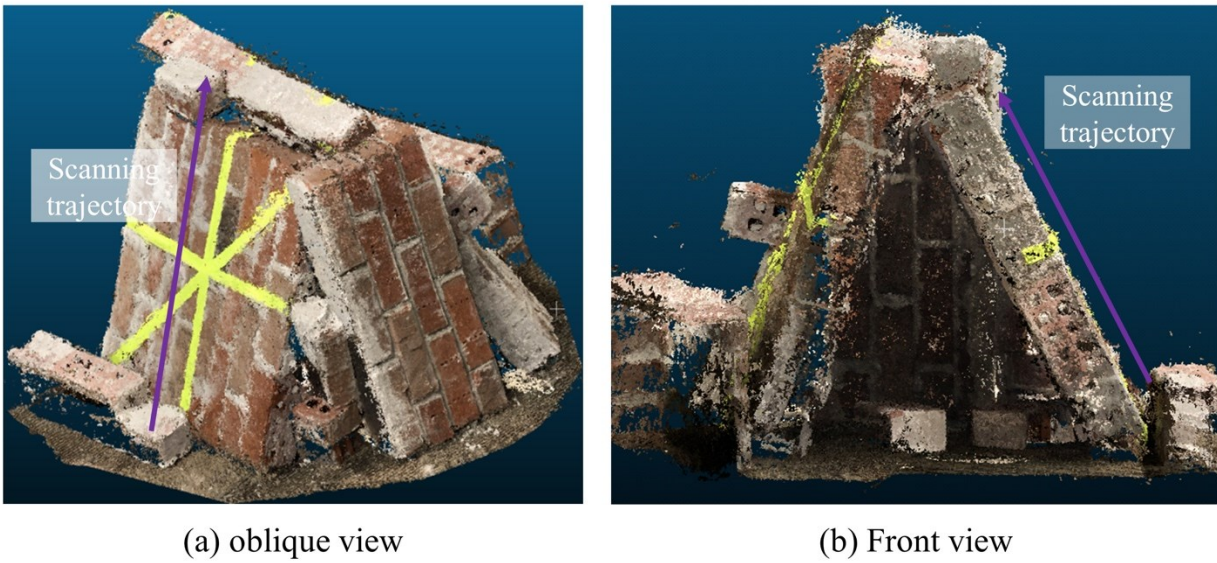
Lean-to collapse built with brick wall: (a) oblique view; and (b) front view
